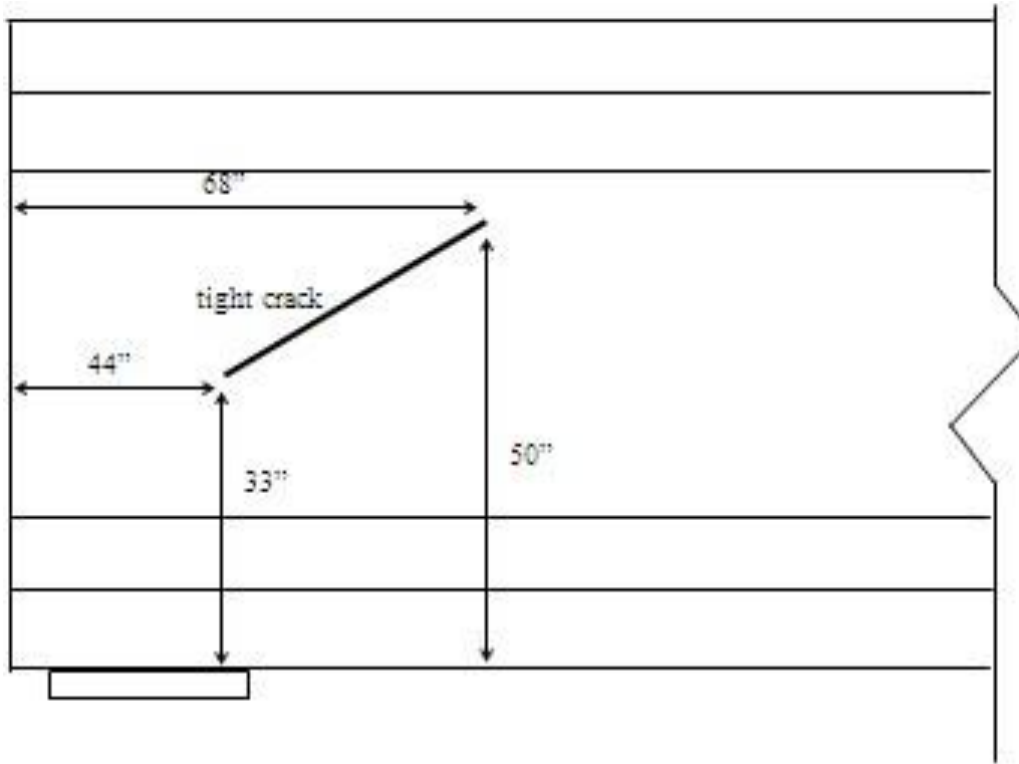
Crack diagram for exterior girder, east side, east face, south abutment (#9728).
